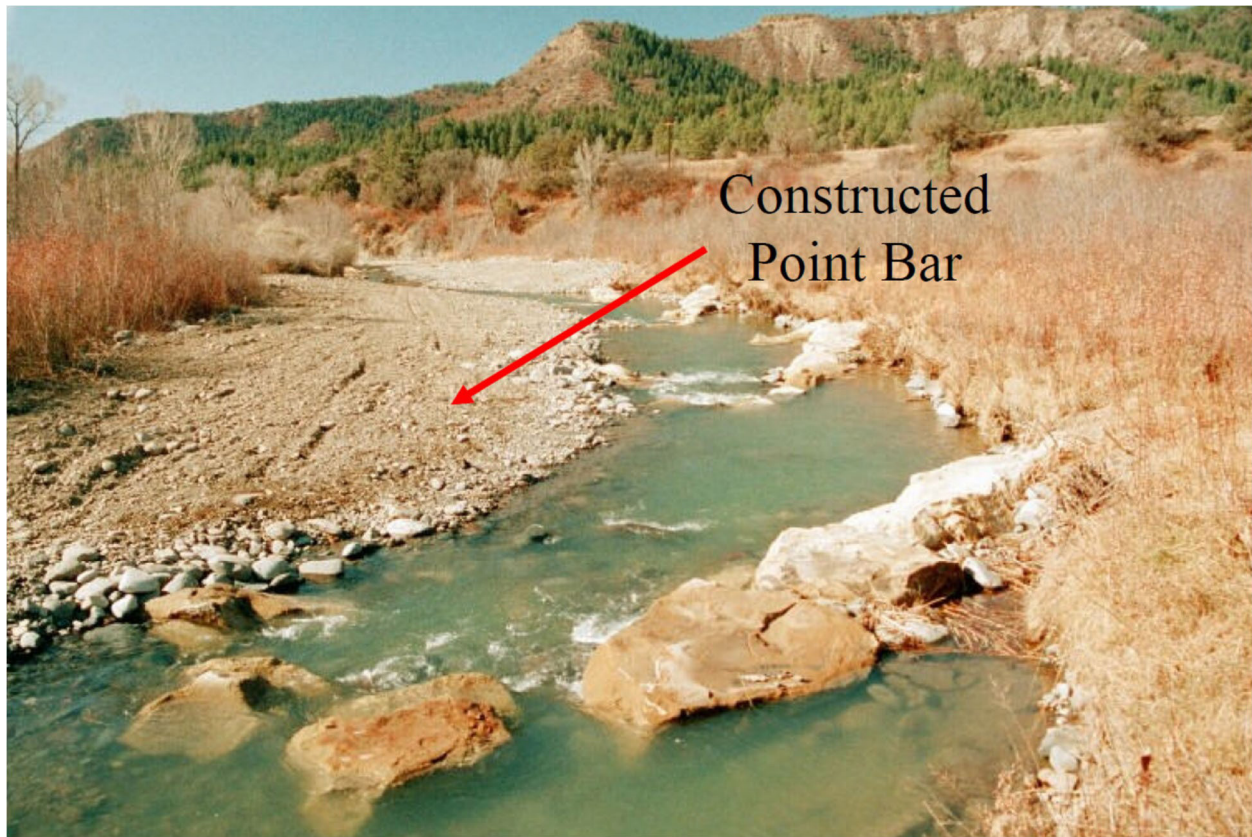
Post-construction photo of J-hook vane and imported gravel point bar.
